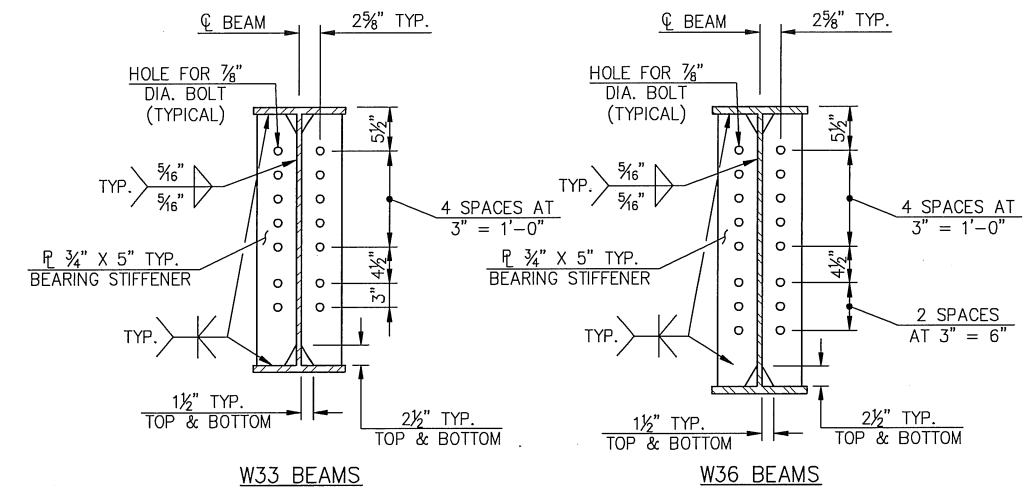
DETAIL SHOWN AT INTERIOR BEAM. OMIT INTERMEDIATE DIAPHRAGM STIFFENERS AT OUTSIDE FACE OF EXTERIOR BEAMS.
